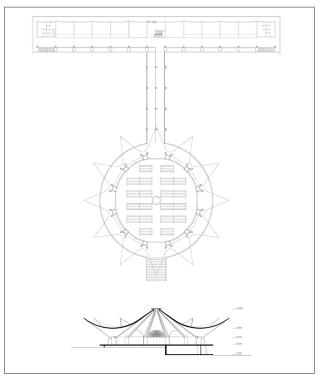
Floor plan and longitudinal section of the Market of Puerto Plata. Source: Author.
